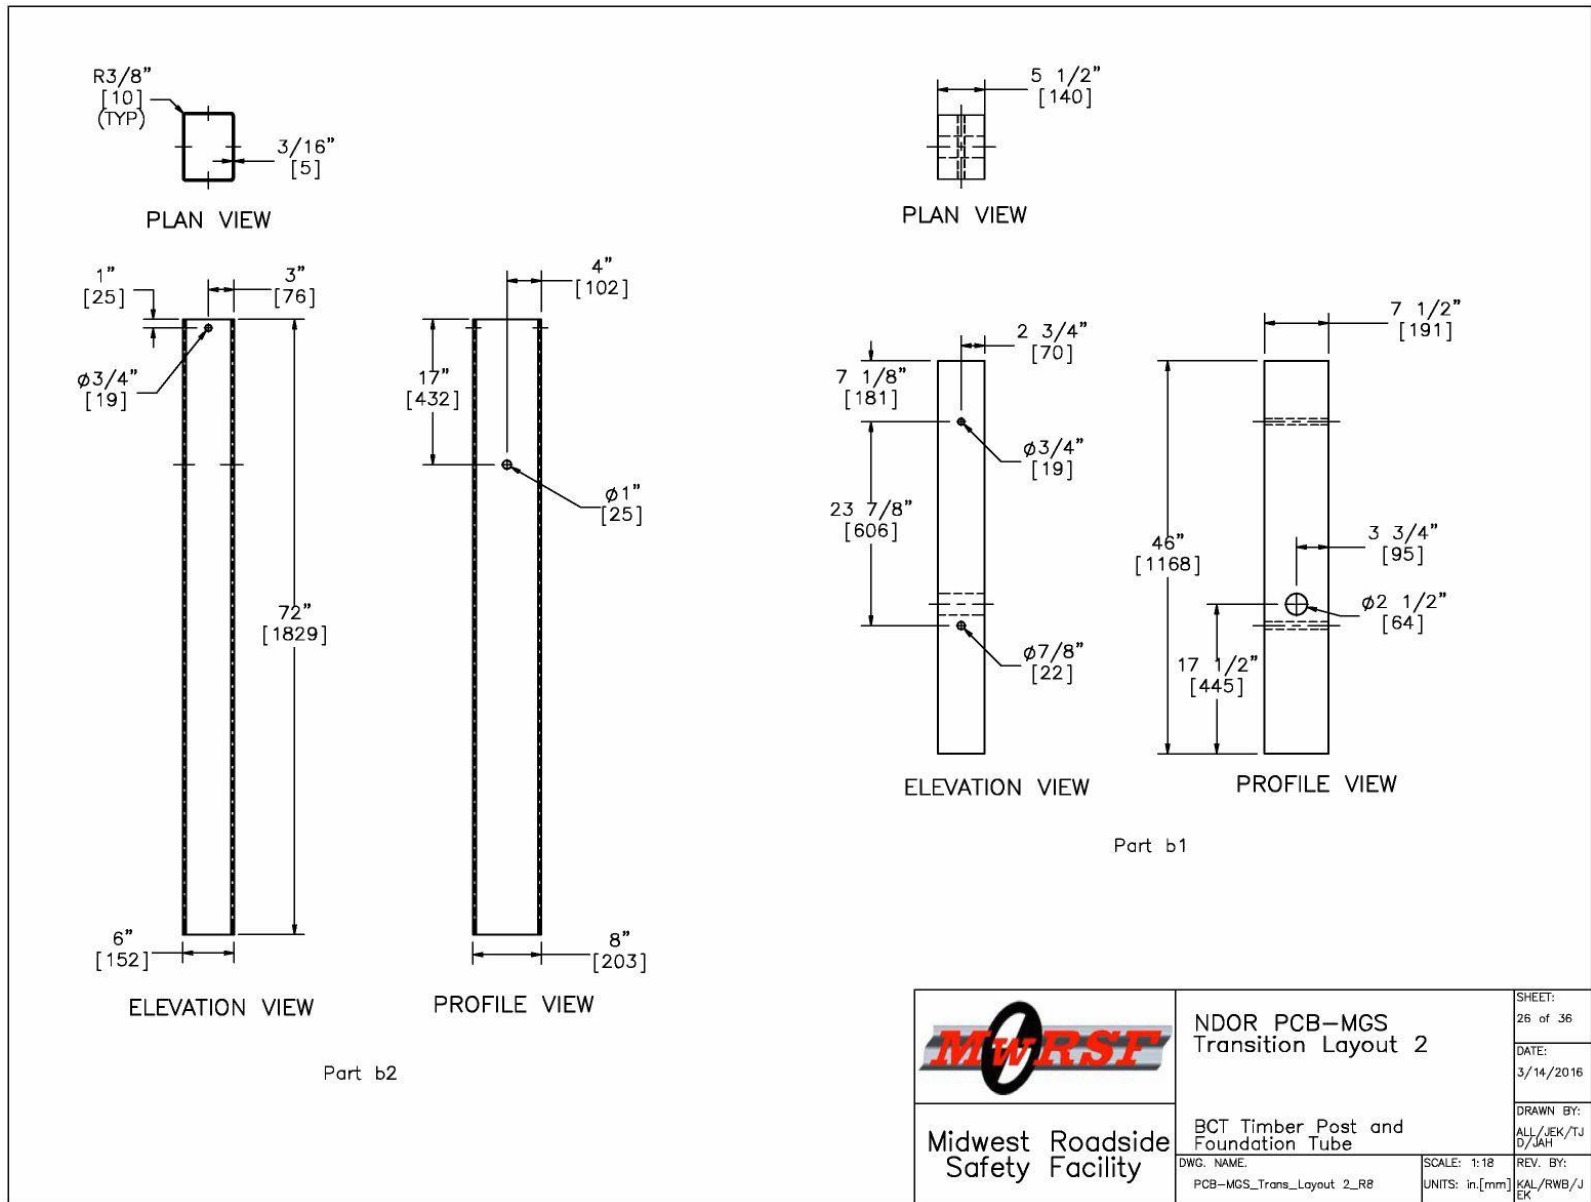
BCT Timber Post and Foundation Tube, Test No. MGSPCB-1
